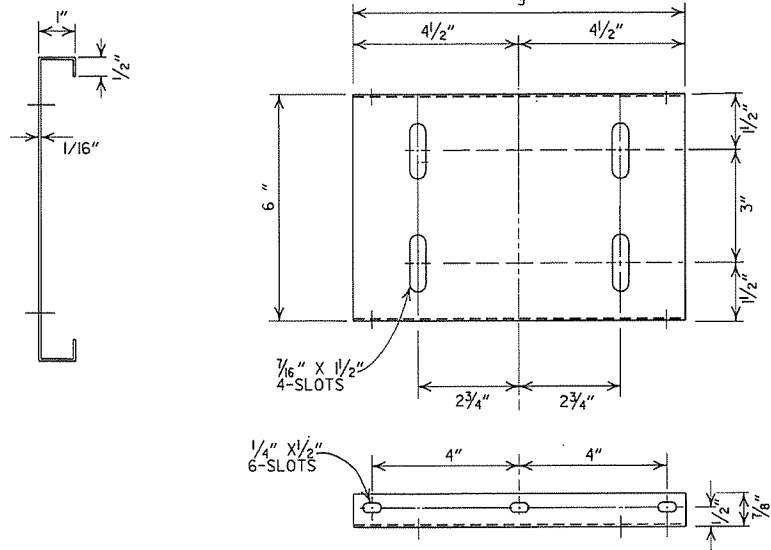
DETAIL OF TERMINAL ANCHOR POST (TYPE I)
